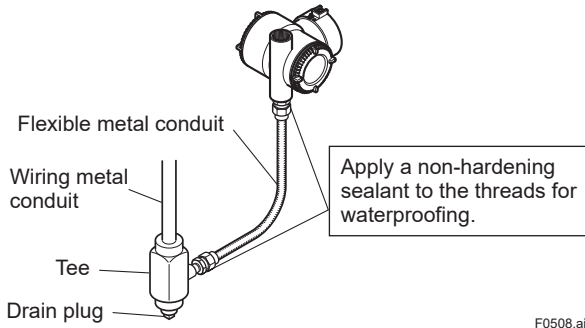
Typical Wiring Using Flexible Metal Conduit
